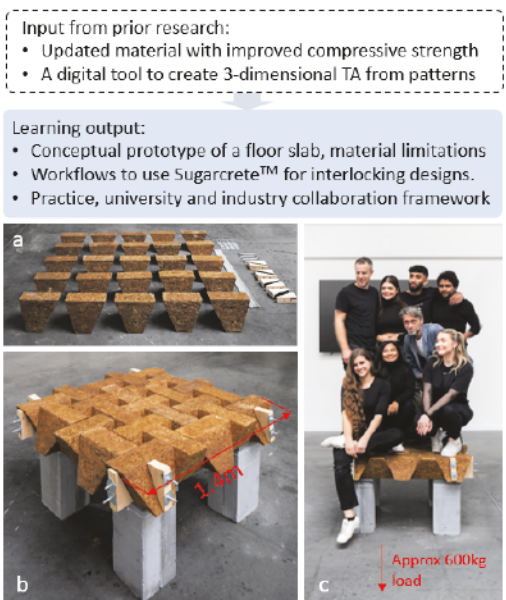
Construction Week Research inputs (above); Kit of parts pre-assembly arrangement (a); assembled prototype (b); experimental loading (c)
